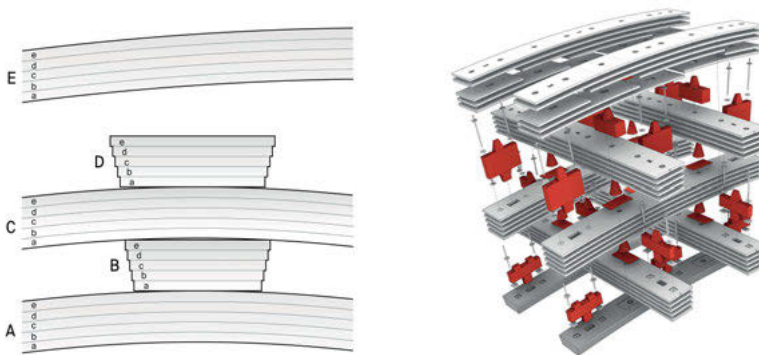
Left: Beam layers composing the roof; Right: detailed roof build up.
